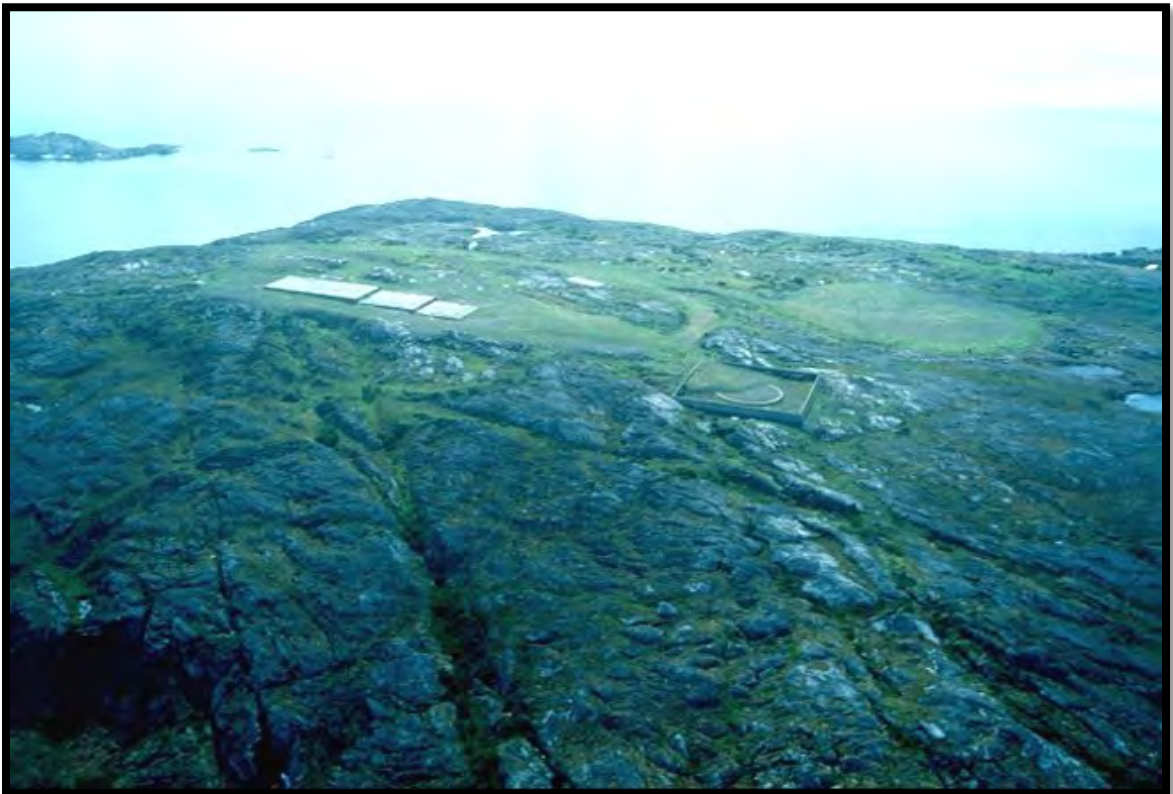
View, looking east, towards the upper Site foundation remains of the main building, disaster shack, and the AST - July 2002.
